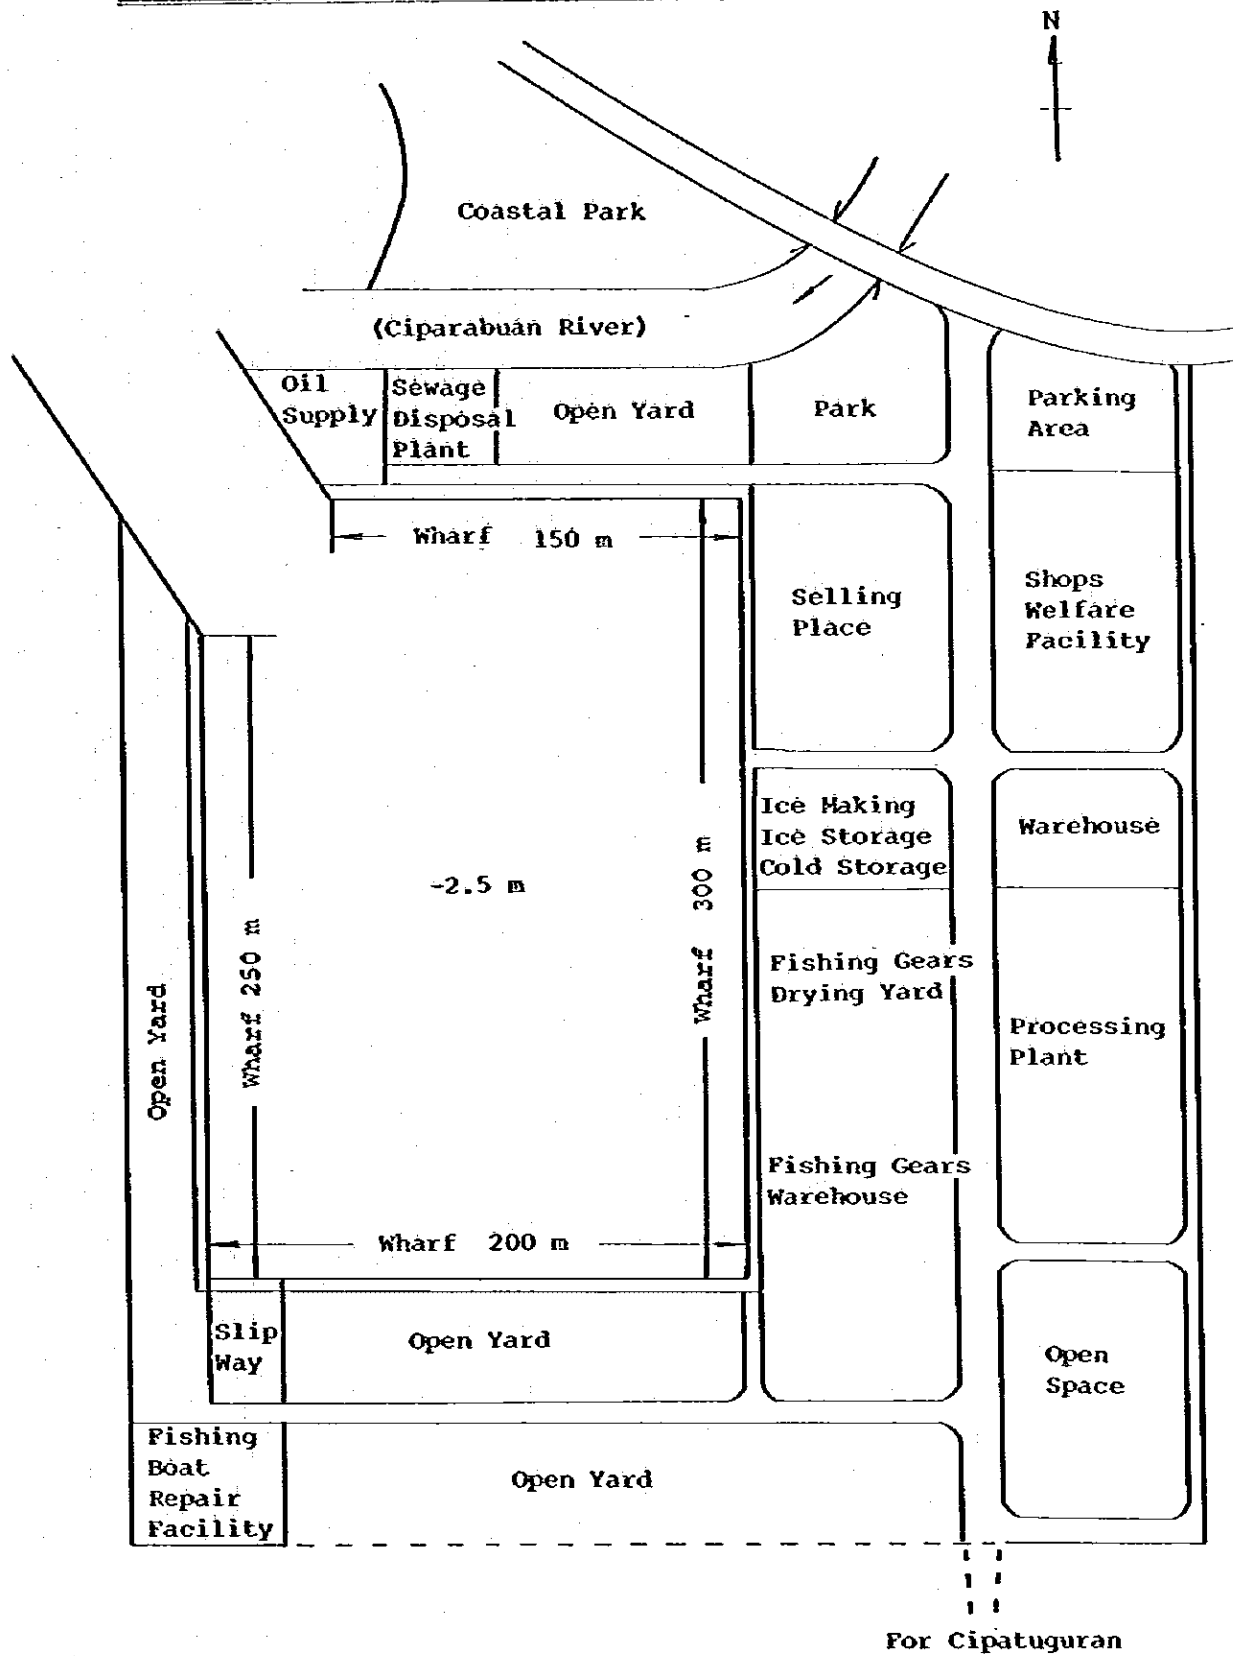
Pelabuhan Ratu Fishing Port Plan (Outline)
